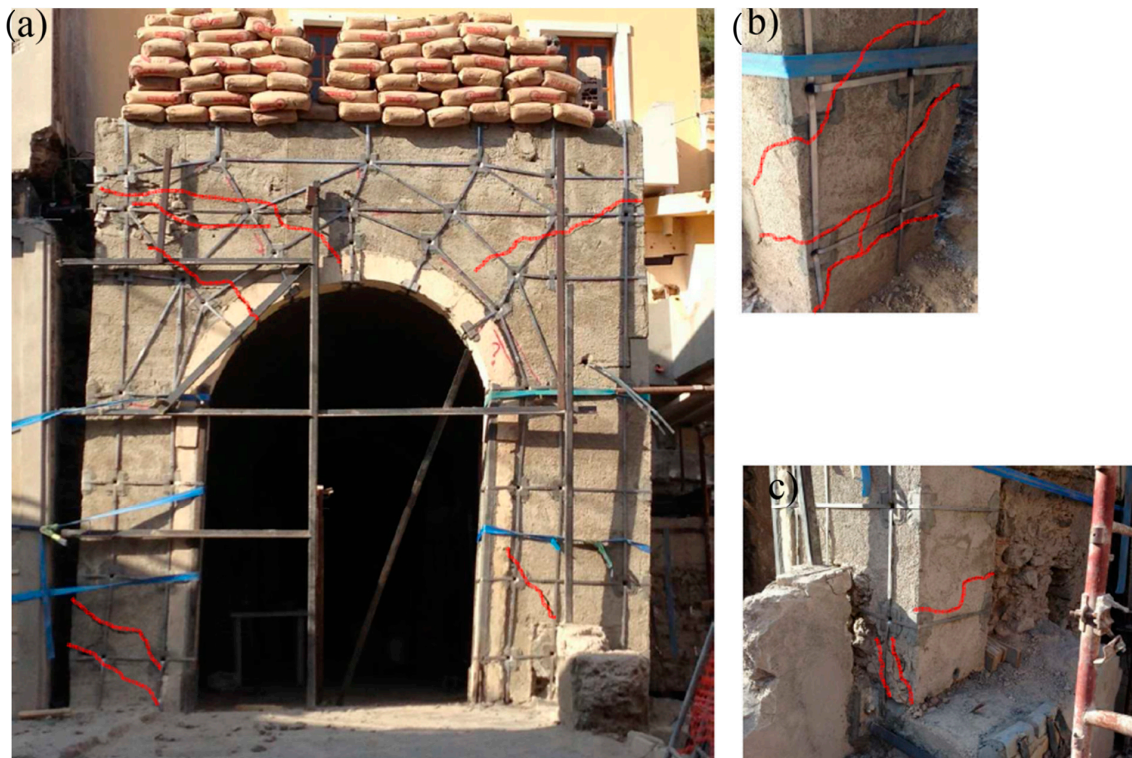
RM wall: (a) crack pattern; (b) left; and (c) right pier.
